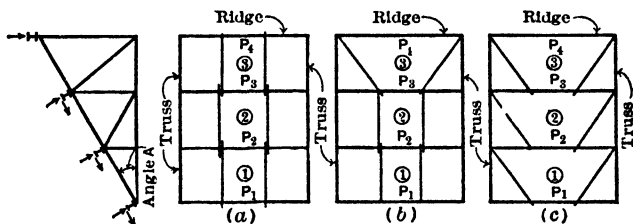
Arrangements of Tie-rods for Supporting Purlins
